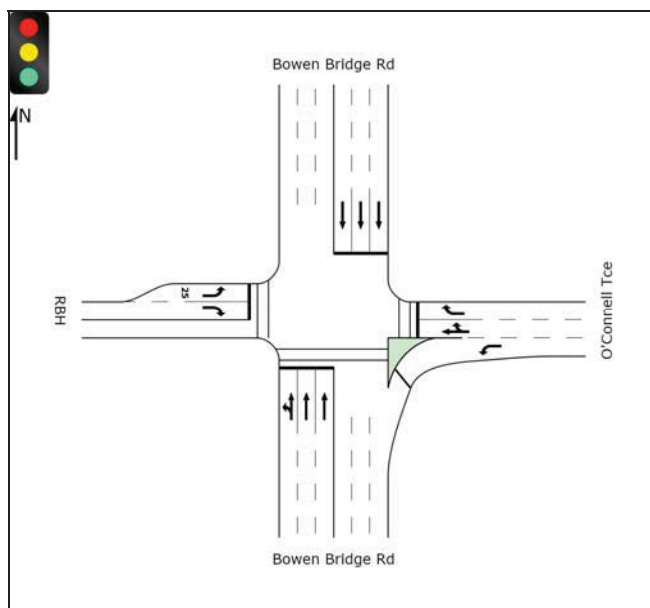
Bowen Bridge Road/O'Connell Terrace/RBH
